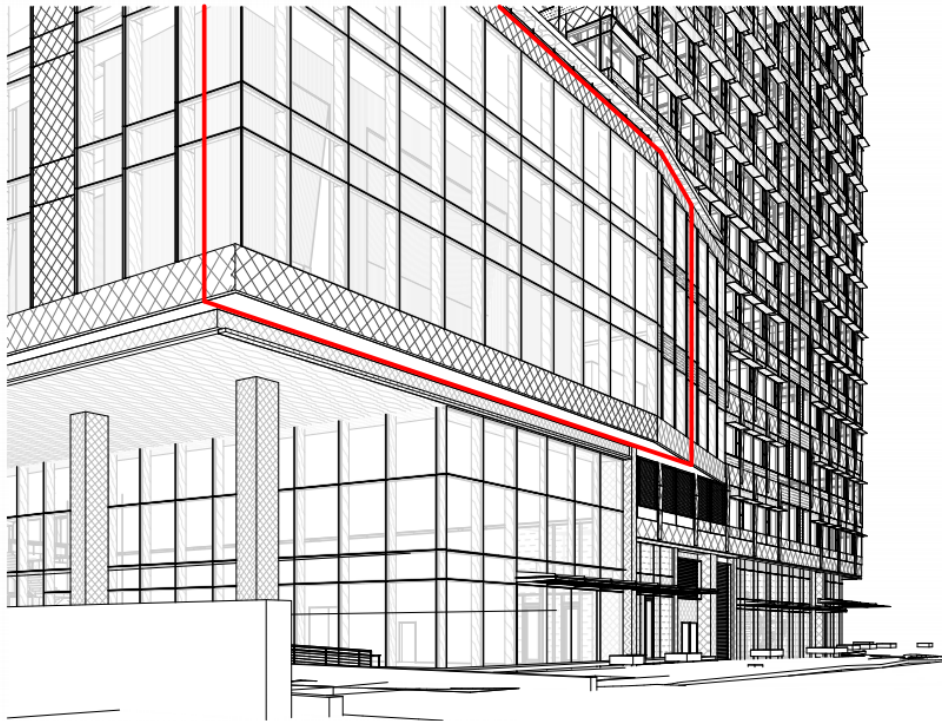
Building Façade along 108th Ave NE showing Extent of Building Overhang
